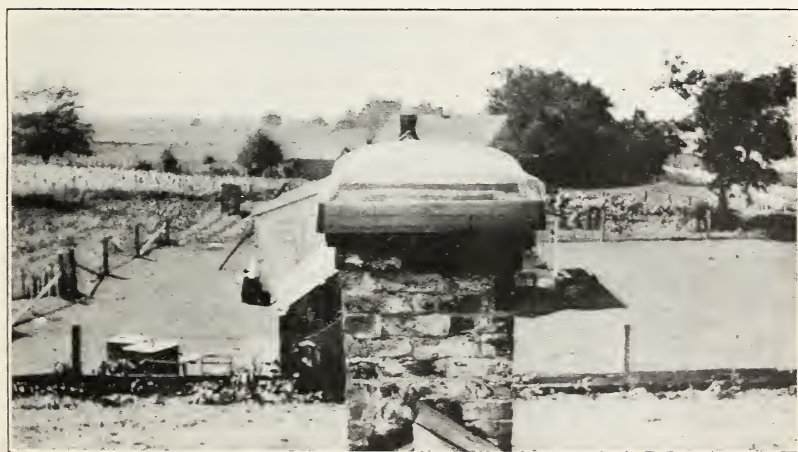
CHIMNEY PROTECTION, RURAL UNIT.
